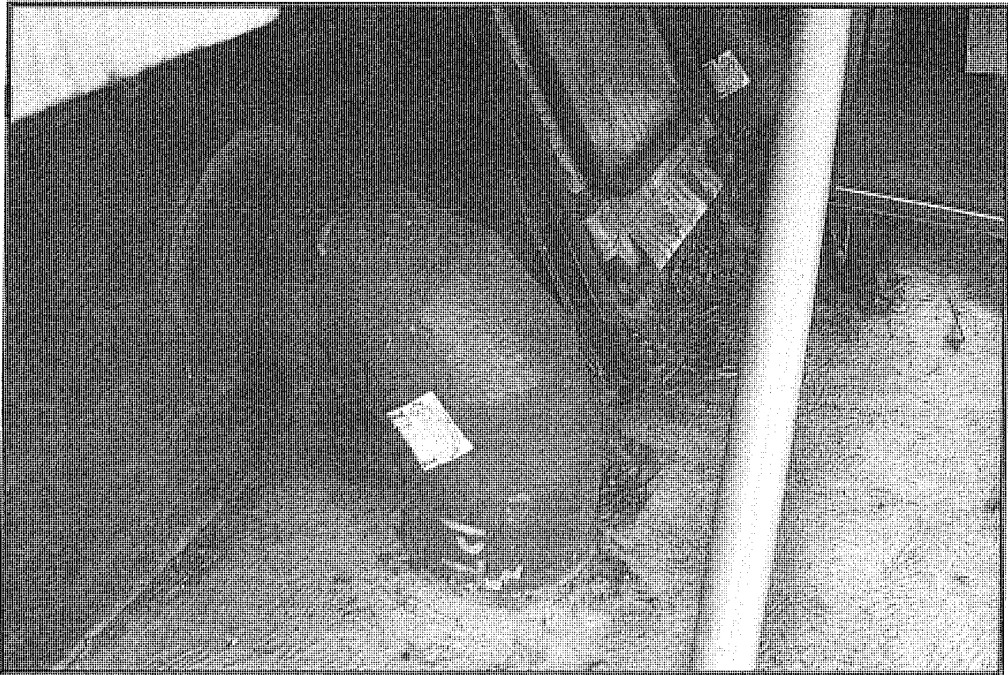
Hot water heating pipe enters Cottage Complex buildings from ground.
